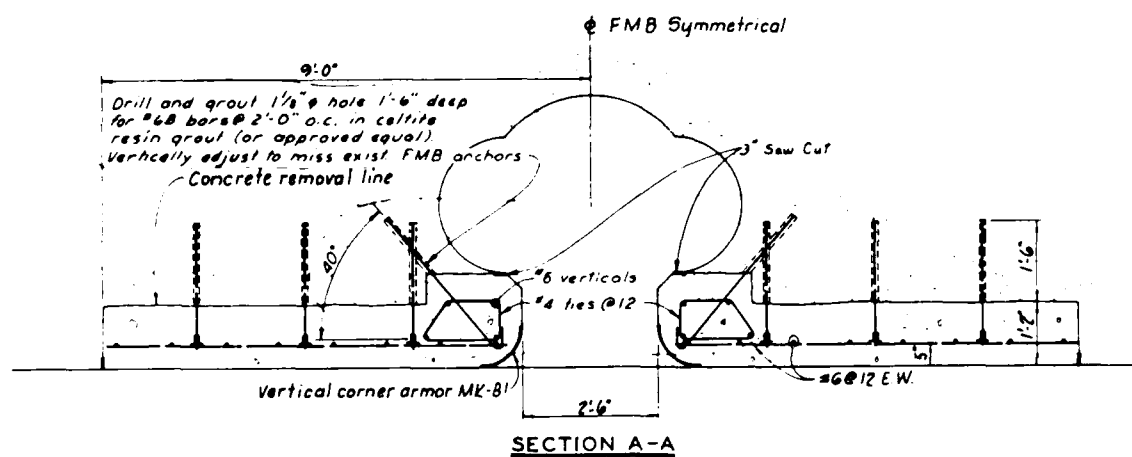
Floating mooring bitt details of Section A-A, Lockport Lock
